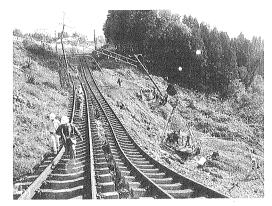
Damage to a retaining wall along National Highway Route 17 and an adjacent embankment along JR Joetsu line (at Kamikatagai, Ojiya city; site 3 in Figure 1)
